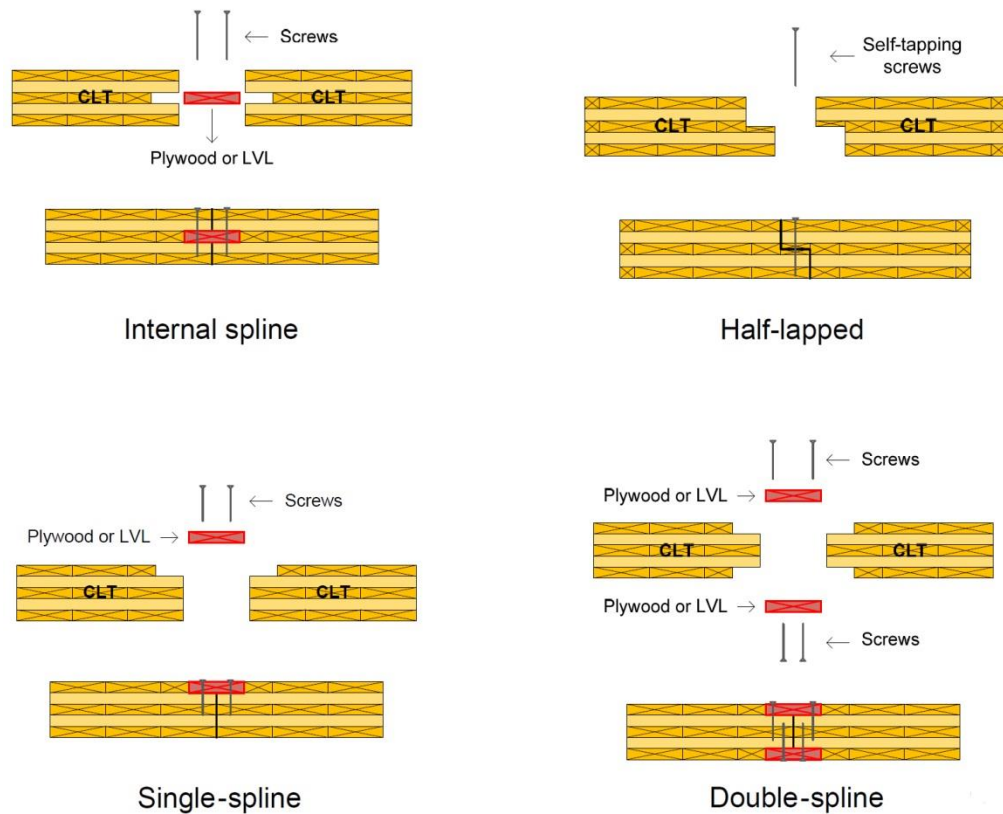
Most common types of connections in CLT Flooring systems (Mohammad, 2010)
